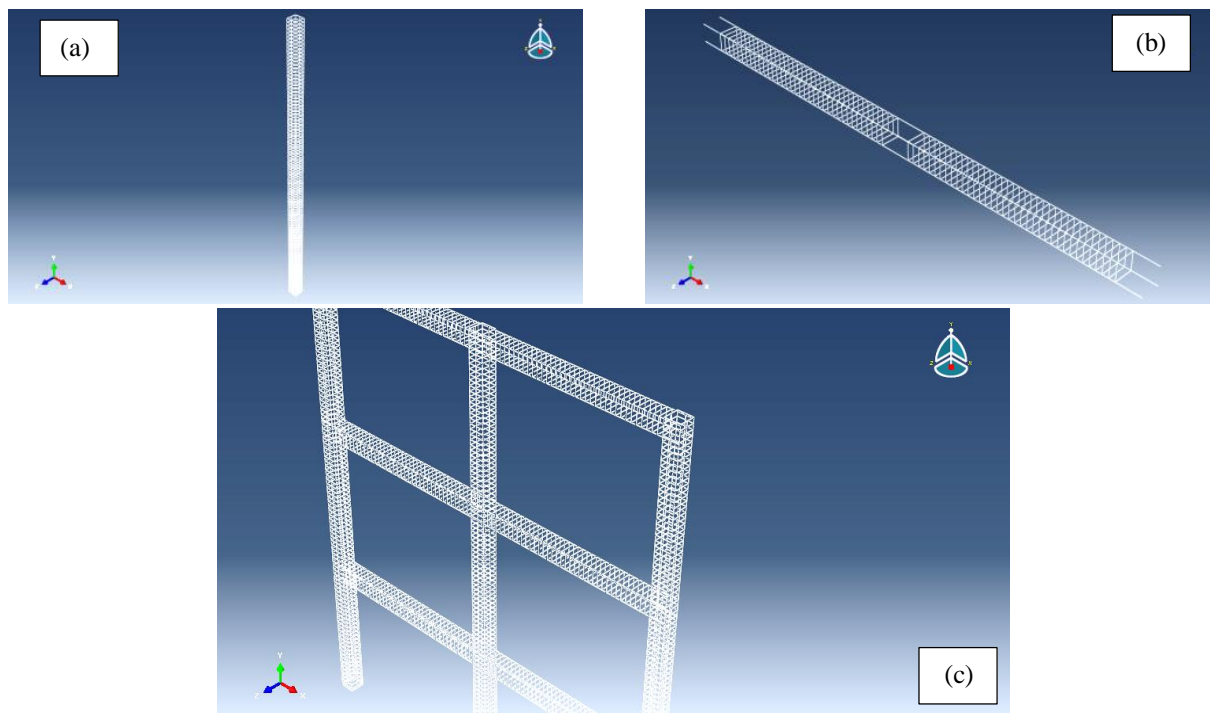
The geometric view of the used rebar; (a) the rebar of the column; (b) the rebar of the beam; and (c) the entire rebar of the concrete frame
